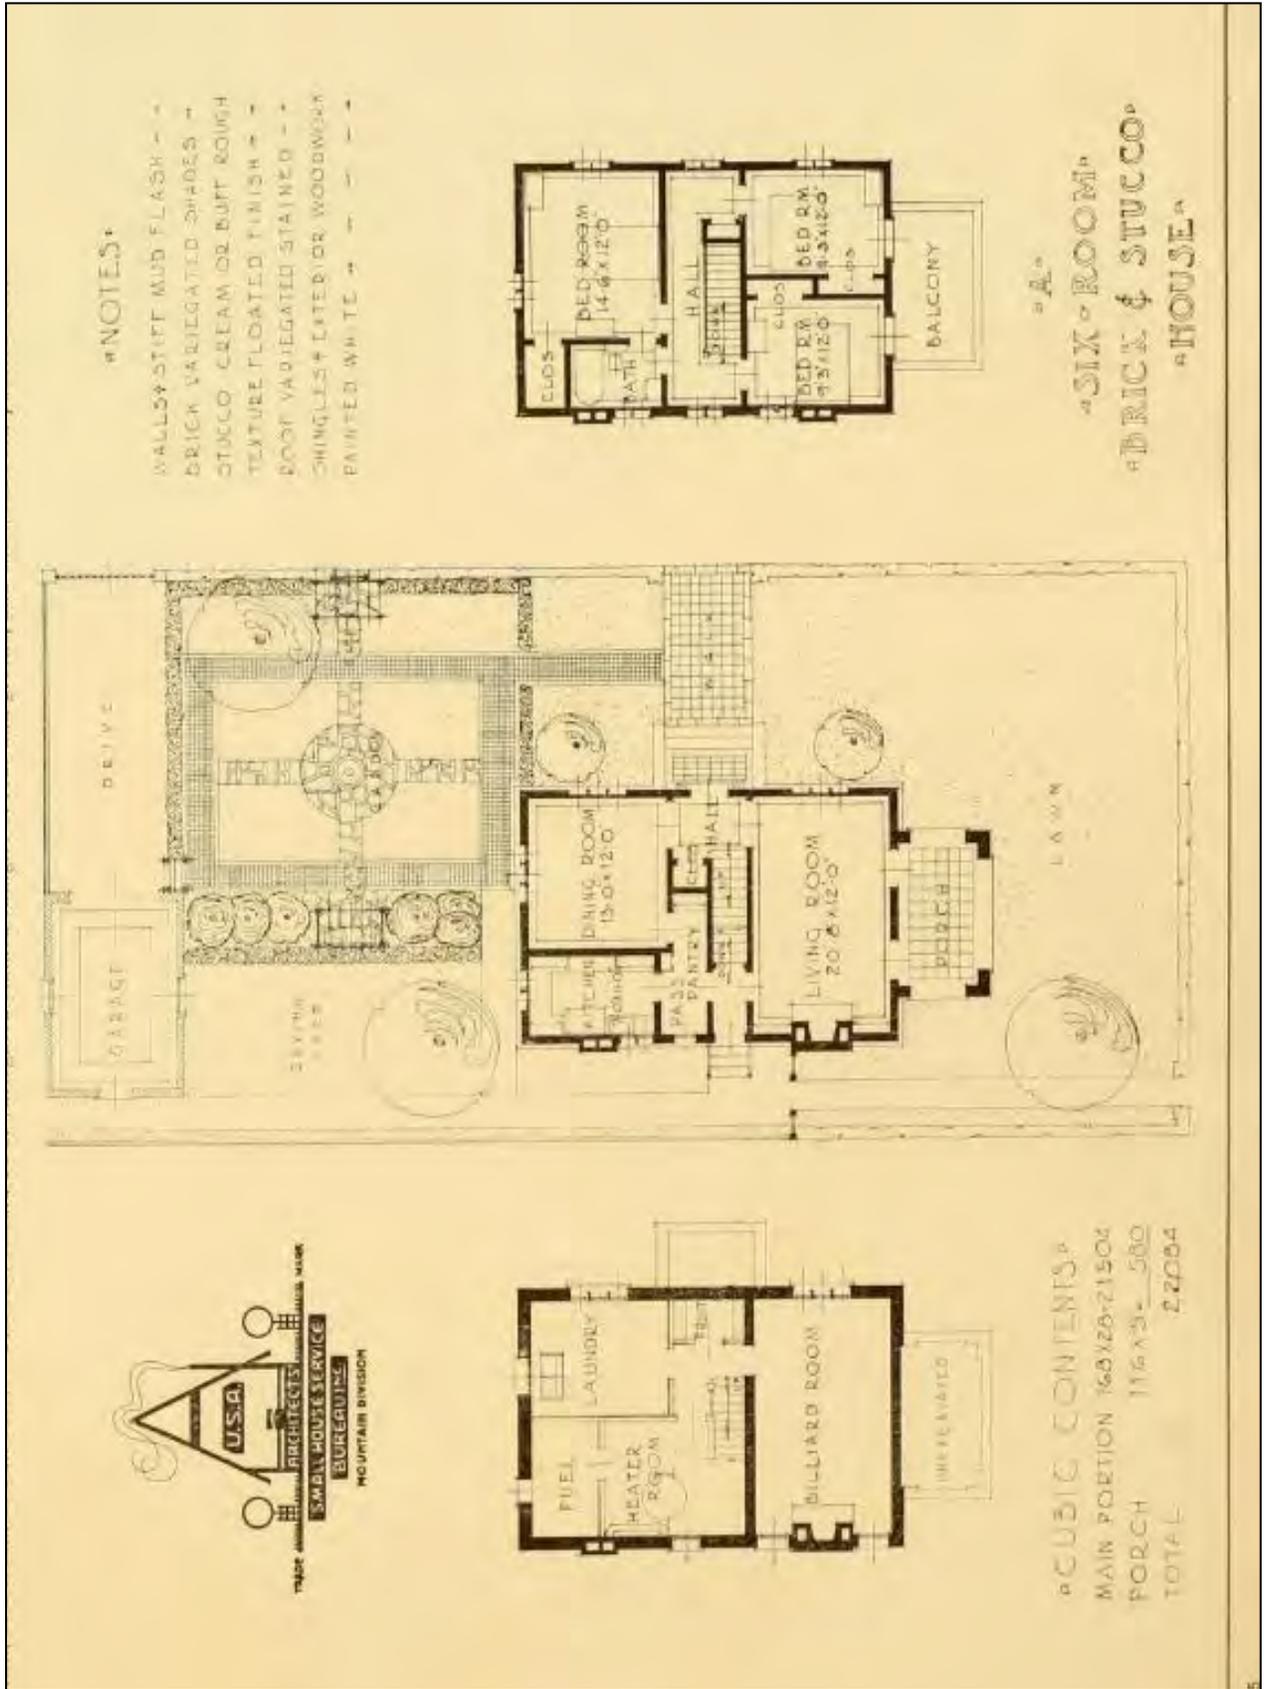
Plan No. 601 (Source: Architects' Small House Service Bureau 1922).
